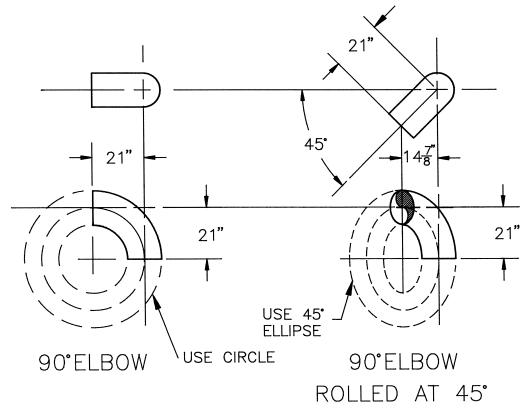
Constructing the 90° elbow rolled at 45°.
